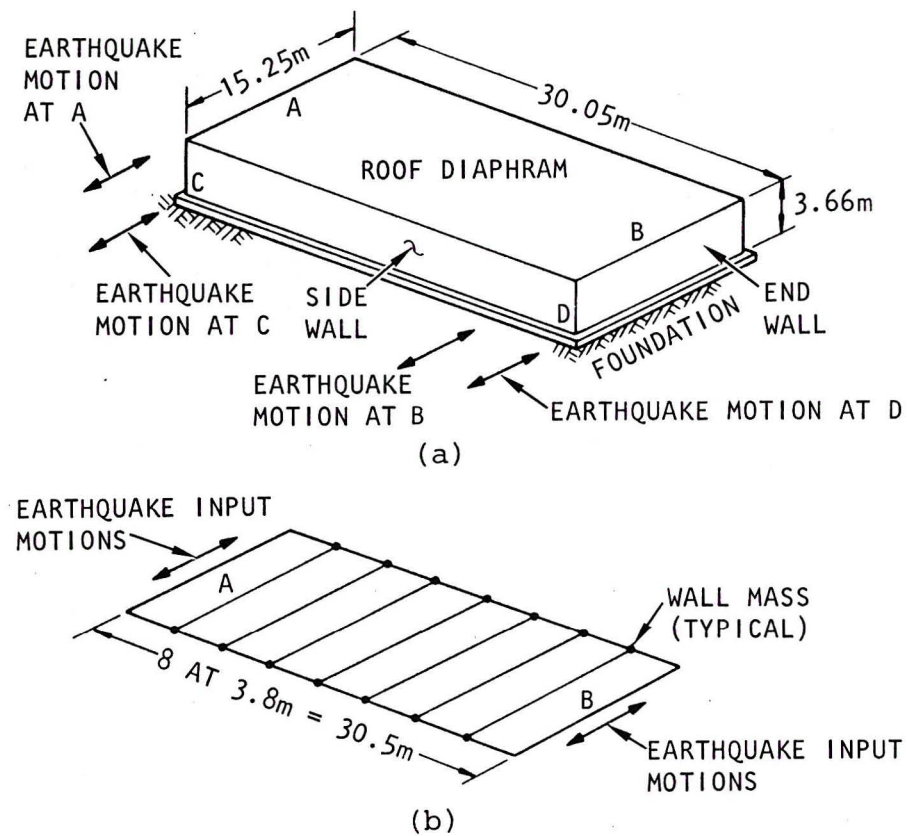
DIAPHRAGM/WALL CONFIGURATION AND ANALYSIS MODEL
